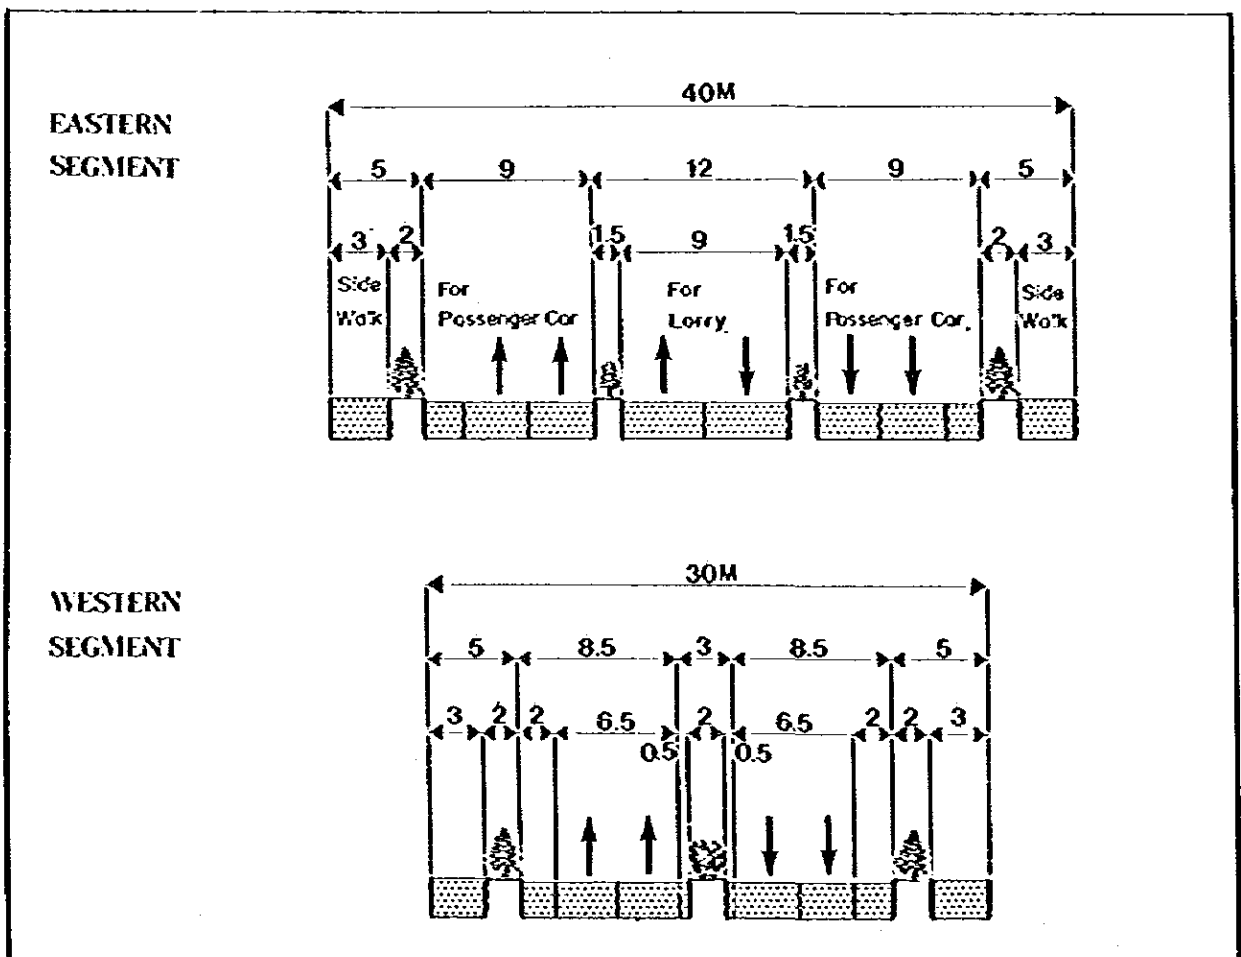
TYPICAL CROSS SECTION (ULTIMATE PLAN) OF THE INNER RING ROAD
